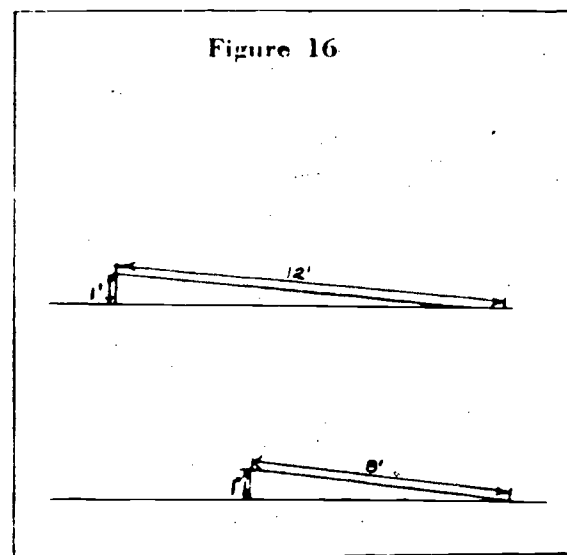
Ramps should not rise more than one foot in 12 feet of length (1 foot in 8 feet in residential areas).
